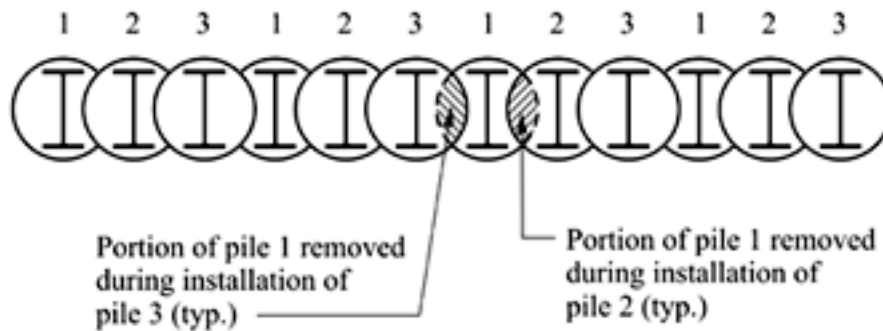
5: Completed secant pile wall (C. Jeremy Hung et al 2009)
